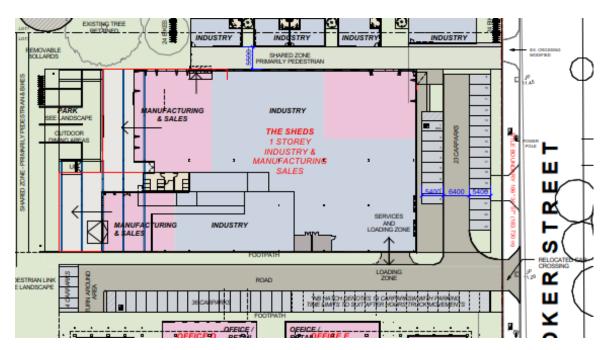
Ultimate arrangement for The Sheds, Source: Site Plan – proposed masterplan (TP004 Rev A) by *Six Degrees Pty Ltd
